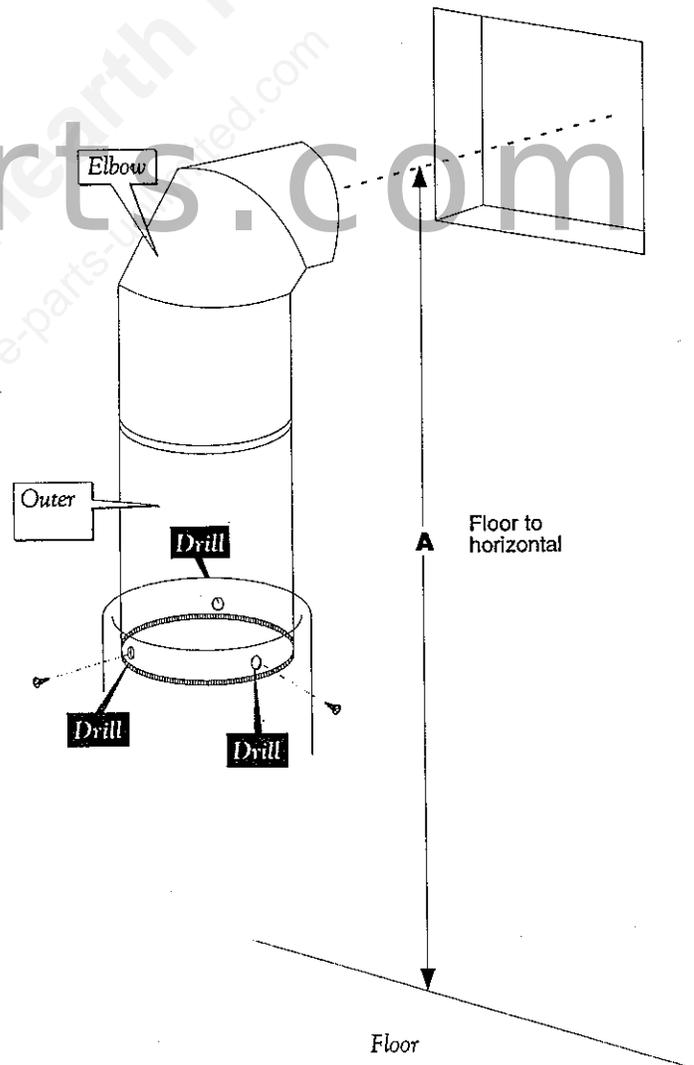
Drilling pilot holes and securing the outer adaptor
